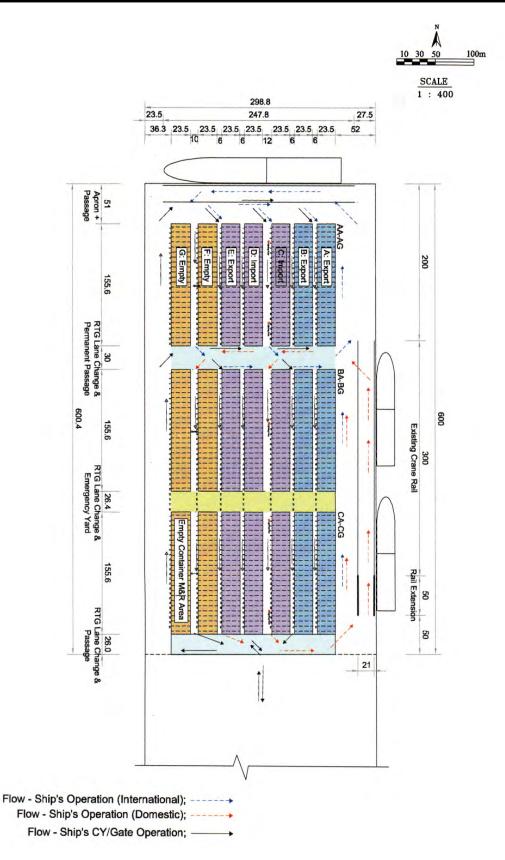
Facility Layout Plan of the Case Study Area of Pier 3
